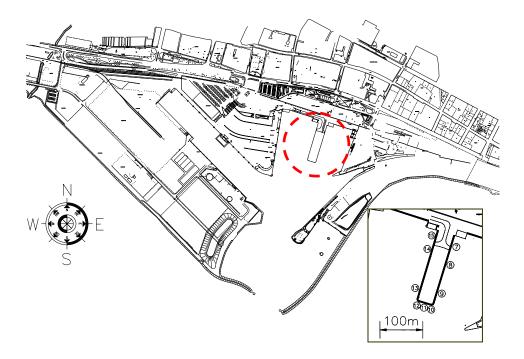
Plan over the Port of Trelleborg showing the inspected pier. The small figure on the right shows the location of the sampling points.
